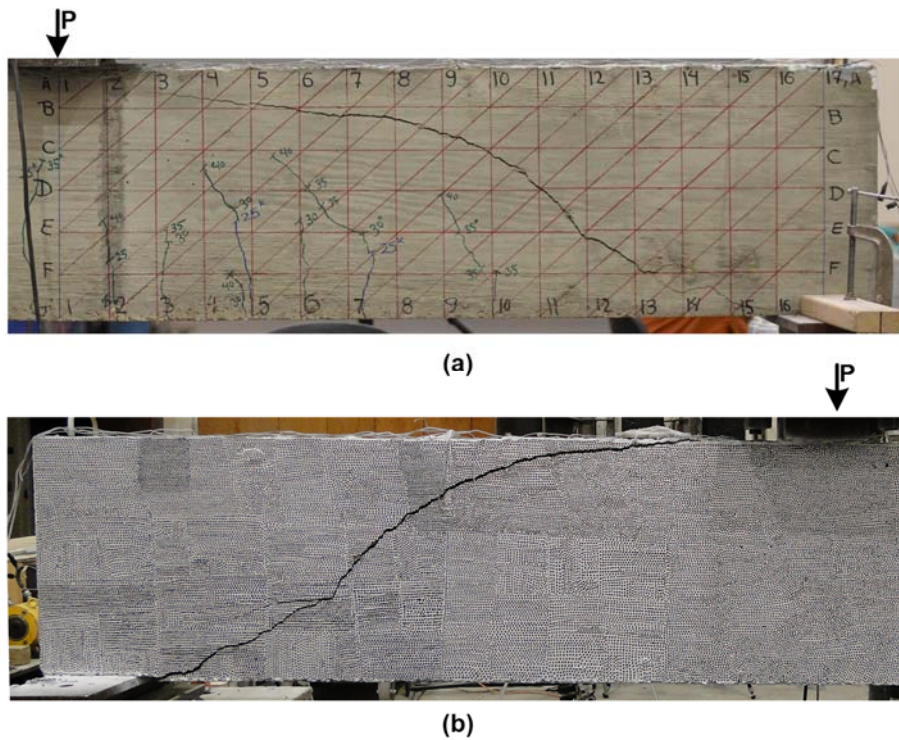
Two different views of the critical crack from the two sides of beam RC18b at failure
